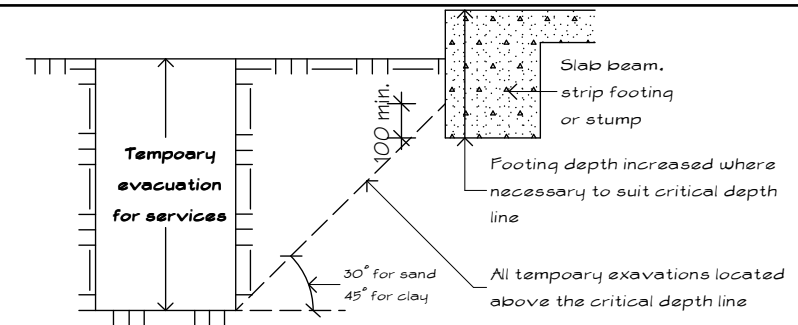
EXCAVATION FOR DRAINS ADJACENT TO FOOTINGS
